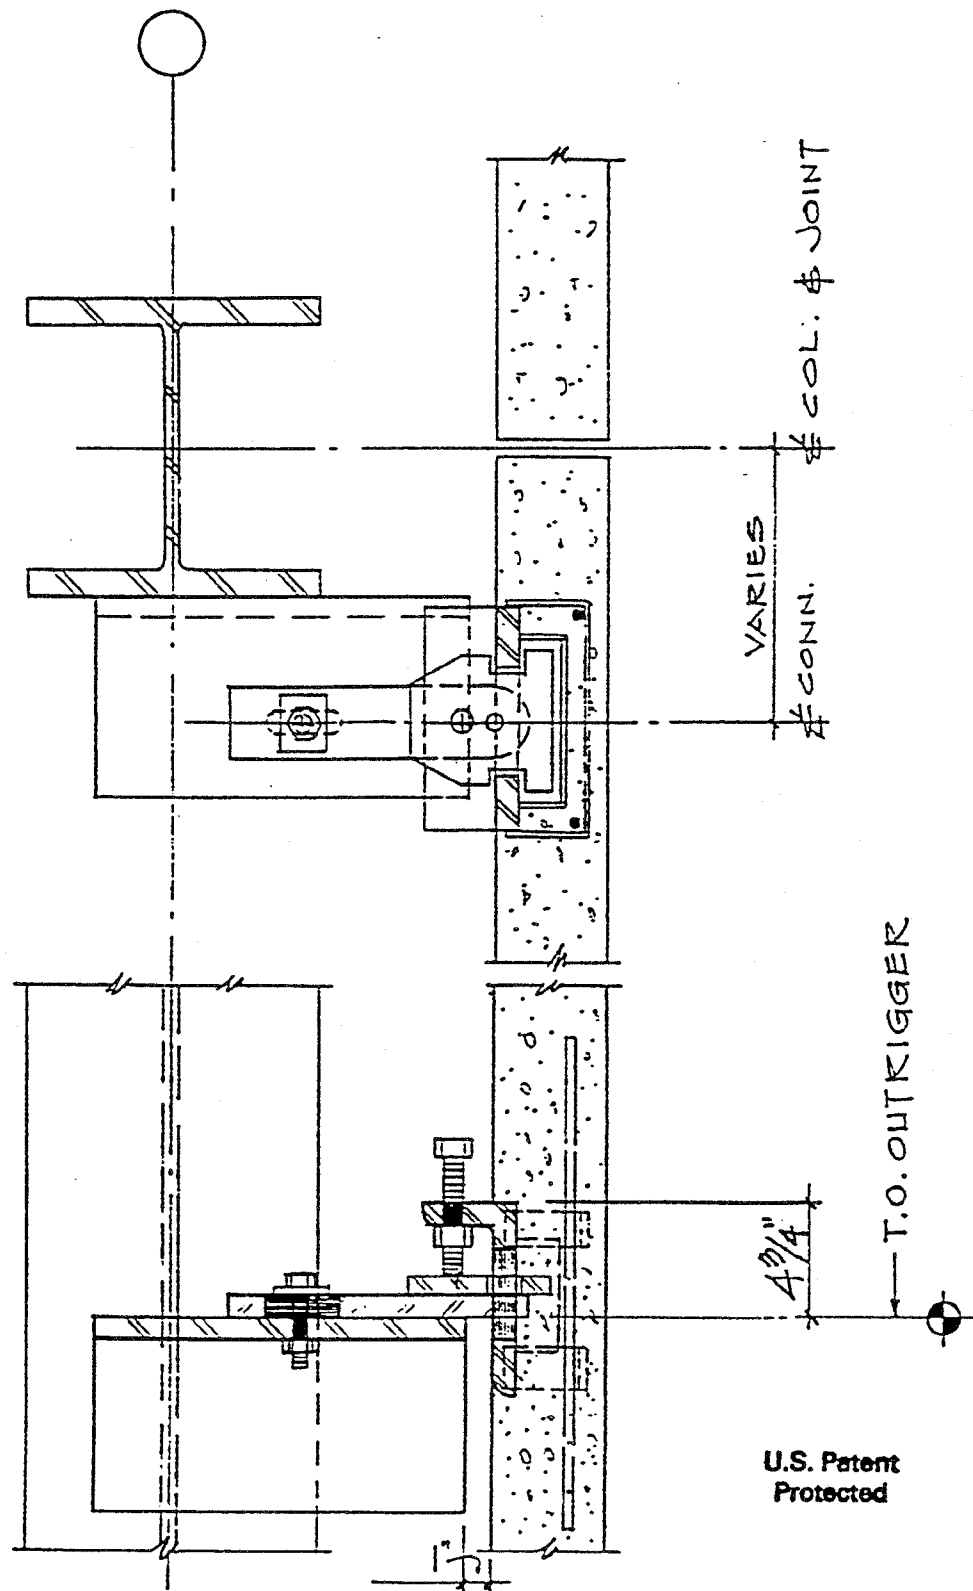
Bearing connection at column (after Hegle [1989]).
